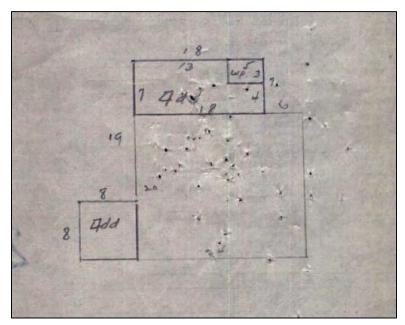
Dimensions of the residence at 827 El Centro Street following the construction of multiple additions during the 1940s. Other additions have since been constructed, including a partial-width front porch (City of South Pasadena 1944).
